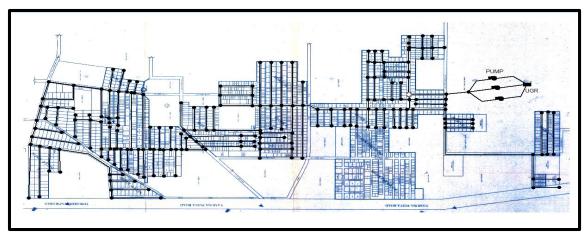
Layout plan of Pradhan enclave, Burari
